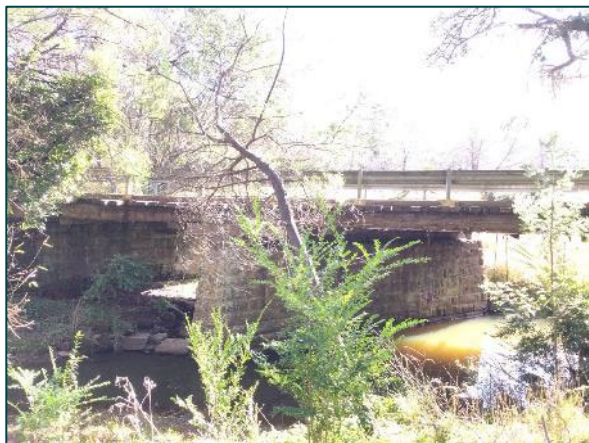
Nattai Creek Bridge showing central pier and existing armaguard railing, facing north.
